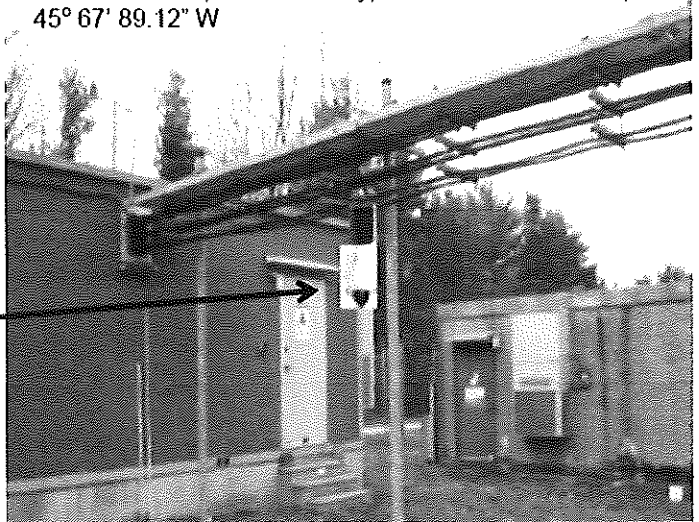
Ground-level photograph with graphic showing proposed equipment installation.
